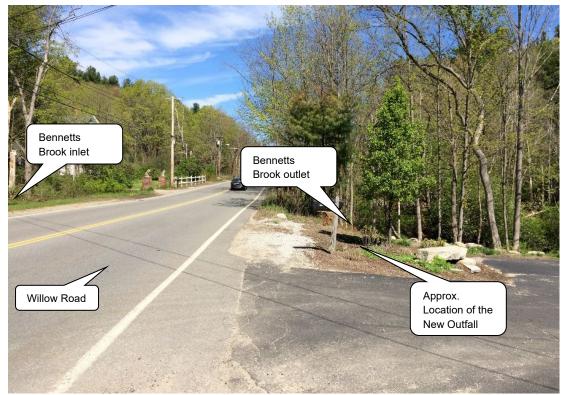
Approx. Sta. 16+00, Willow Road crossing over Bennetts Brook, view from northbound shoulder
